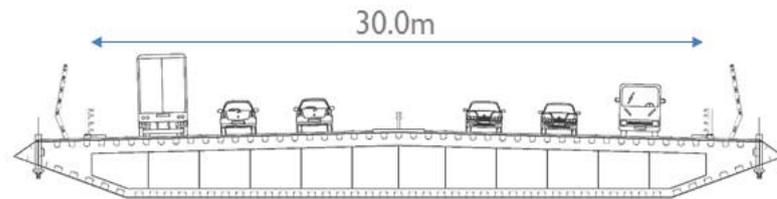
INDICATIVE DUAL 3 LANE BRIDGE CROSS SECTION
